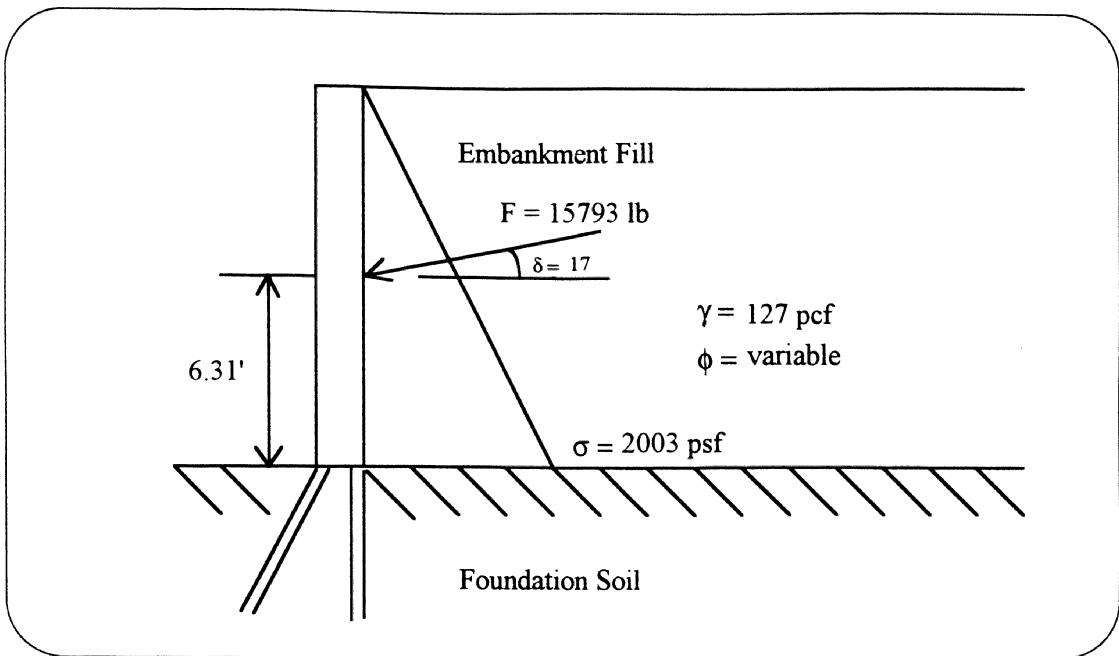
Lateral Earth Pressure, North Abutment Bridge B
